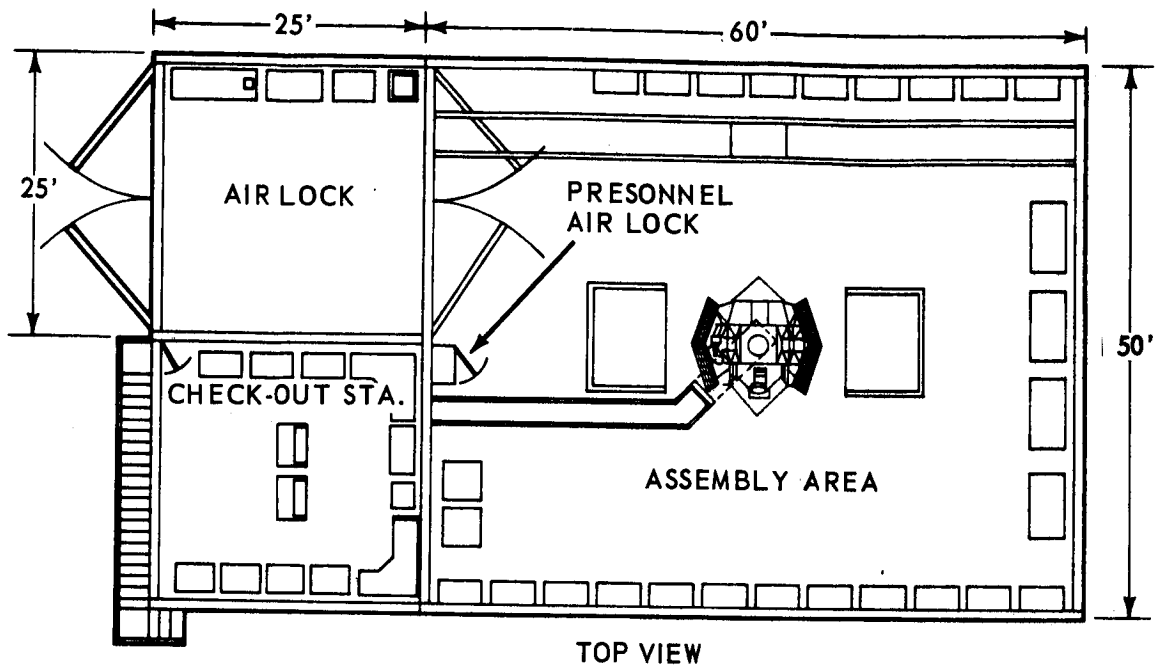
Spacecraft Assembly and Checkout Station
